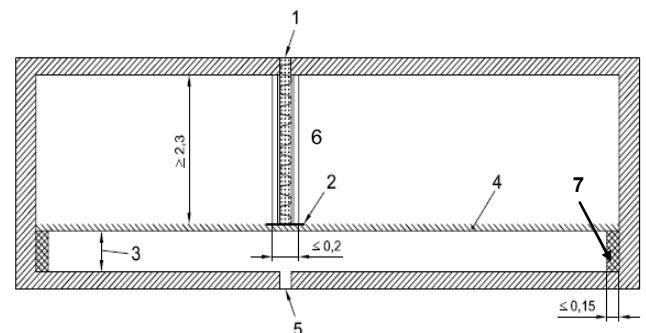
Requirements of the test chamber [2]: 1) and 5) elastic separations; 2) flexible material; 3) floor height; 4) access floor; 6) dividing wall; 7) sound absorbing material
